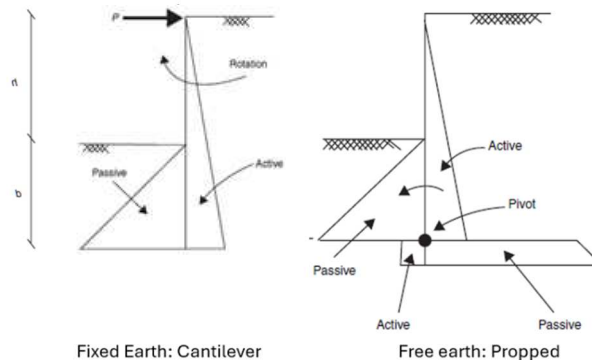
Fixed earth and free earth embedded retaining wall pressure diagrams
